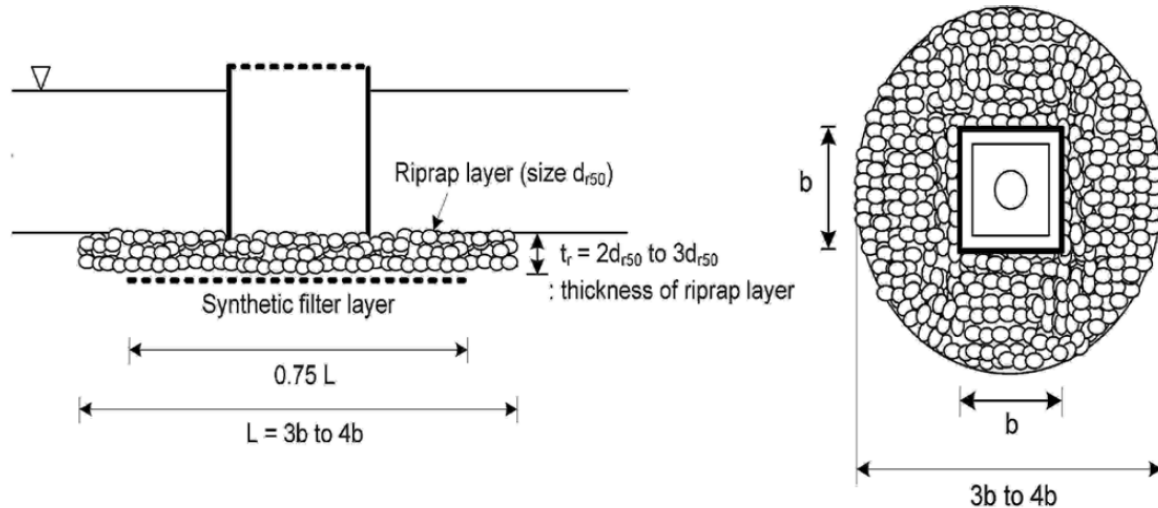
Recommendation for riprap layer around bridge pier (Lauchalan and Melville, 2001)
